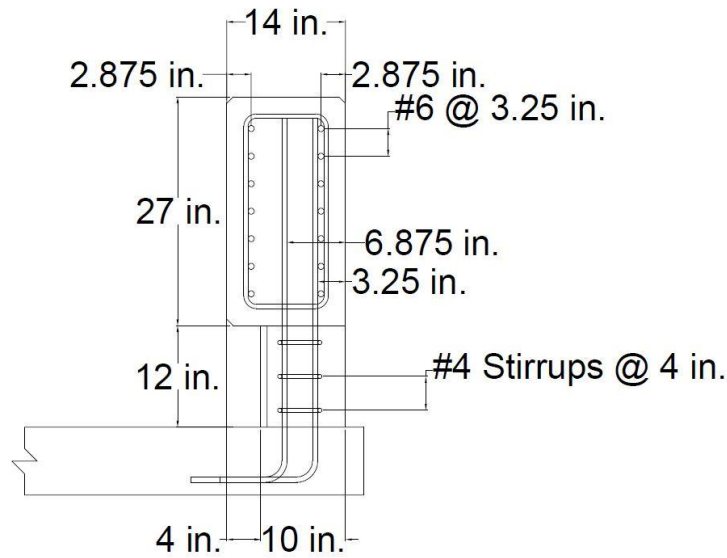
New Open Concrete Bridge Rail End Section, Cross Section
